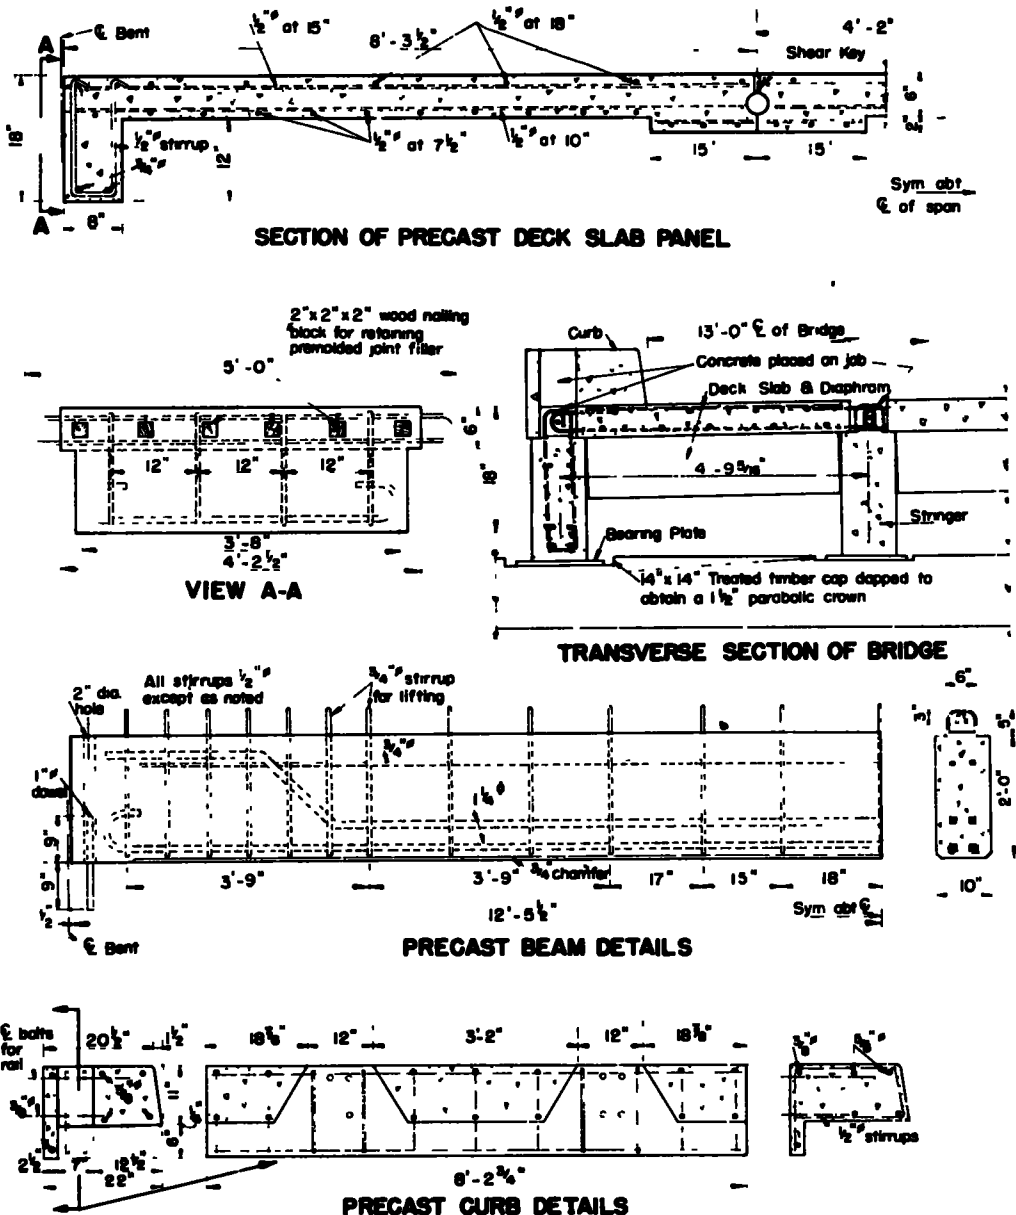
Proposed Precast Deck Details - Eliminating All "On the Job" Formwork - Details not shown are similar to those in Figure 7.
